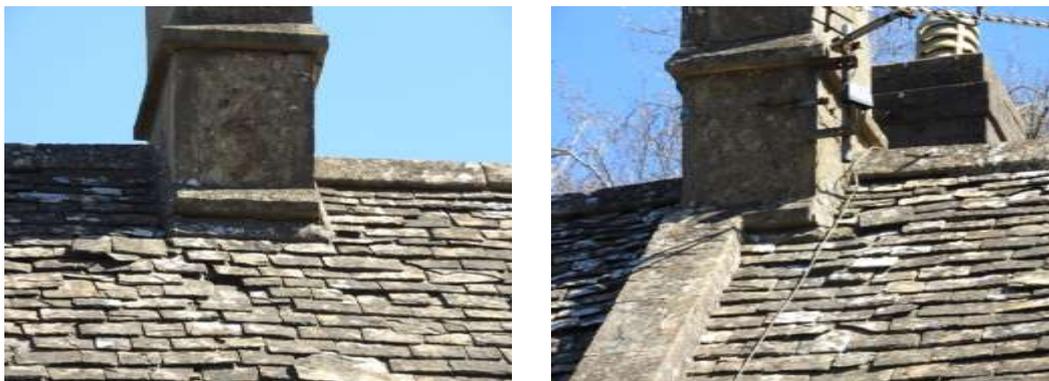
& 17 Ridge and roof tiles to the rear and mono-pitched extension
